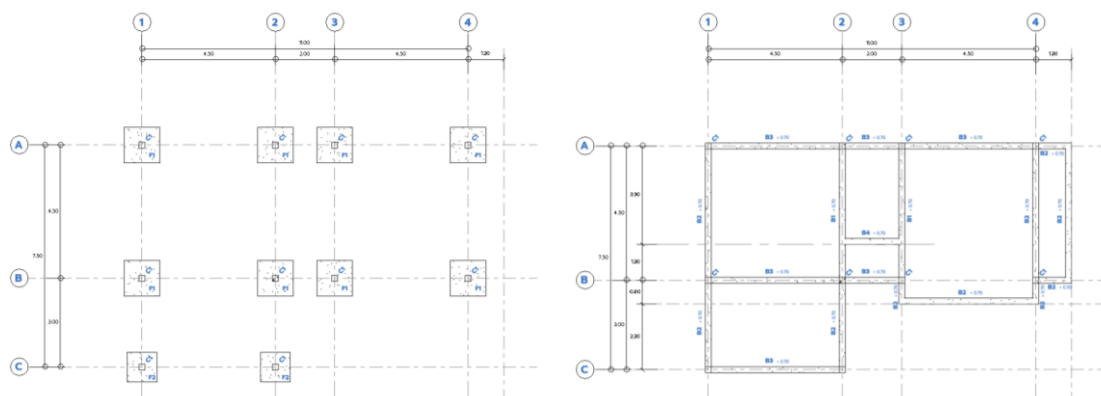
Foundation Structure Plan and Beam Structure Plan, 2D Construction Drawing
